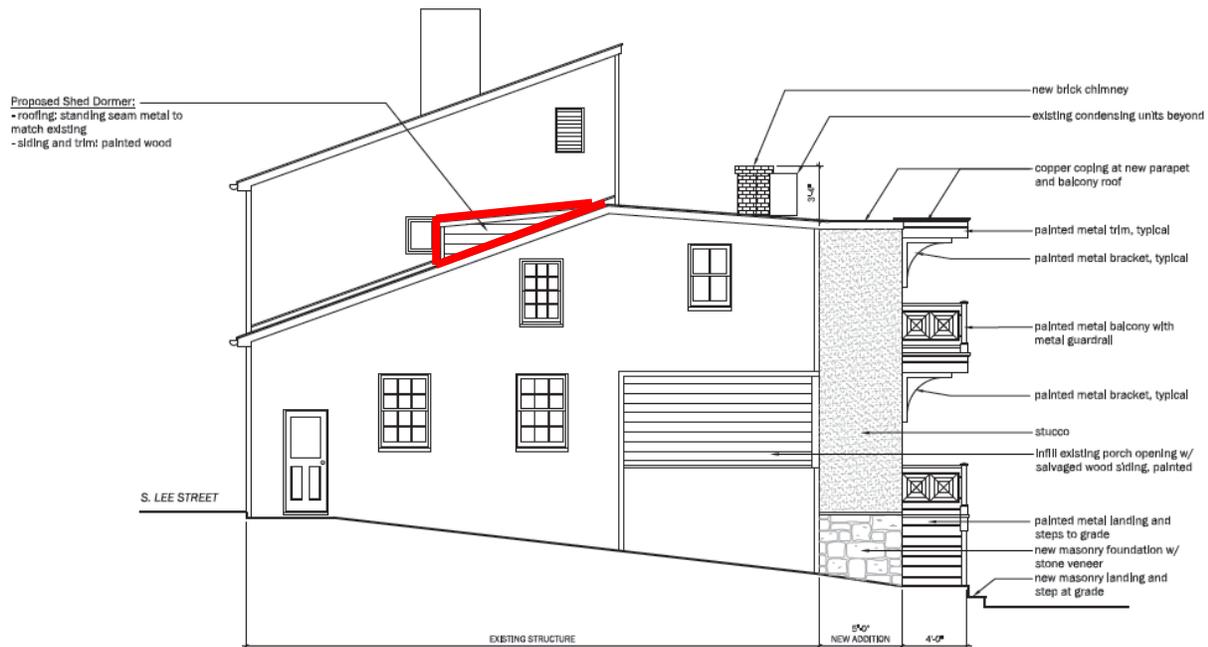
Side (south) elevation showing location of shed dormer set back from building face.
